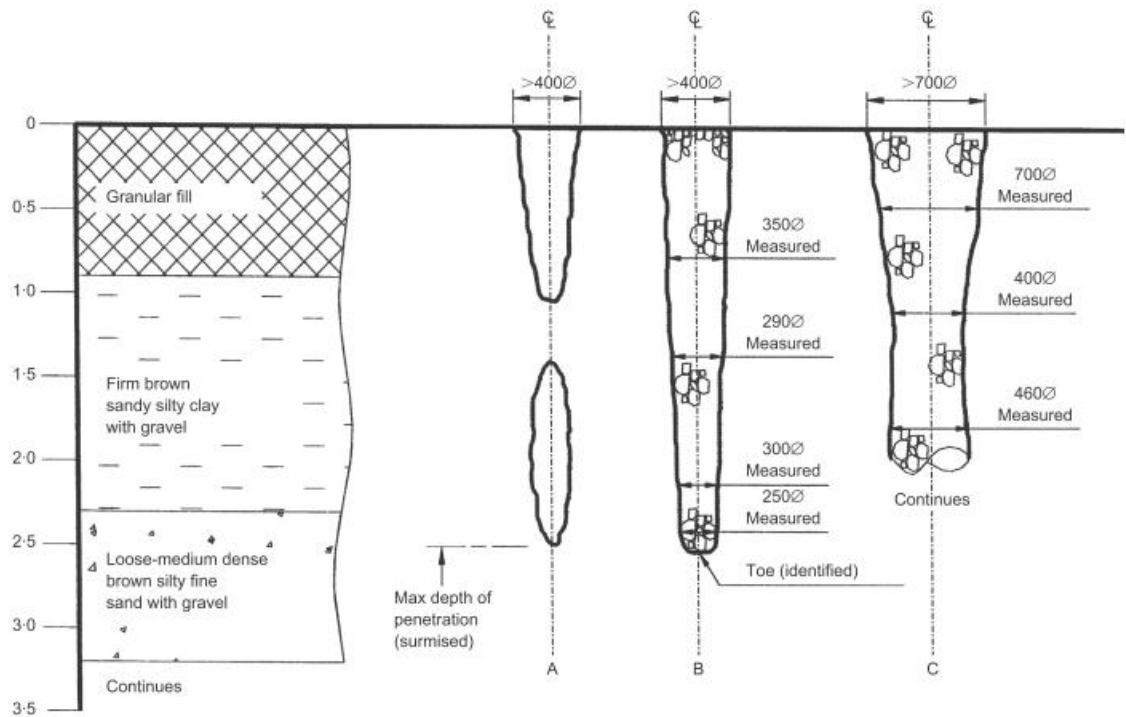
Poor quality control during stone column installation (after Bell, 2004).
